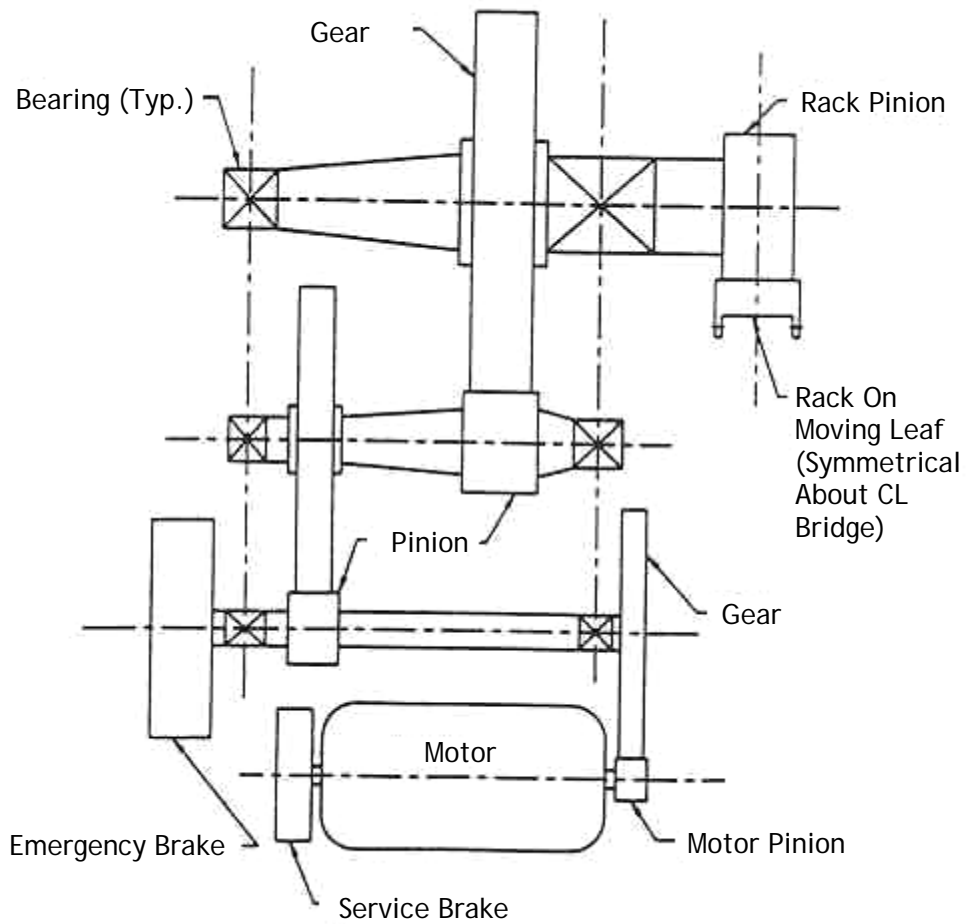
Trunnion Bascule Bridge Machinery (One Quarter Shown) is Located Outside of the Bascule Trusses on the Pier
